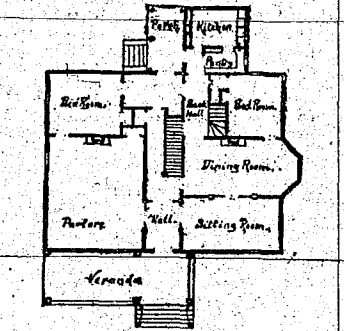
GROUND PLAN OF IMPROVED HOUSE.
